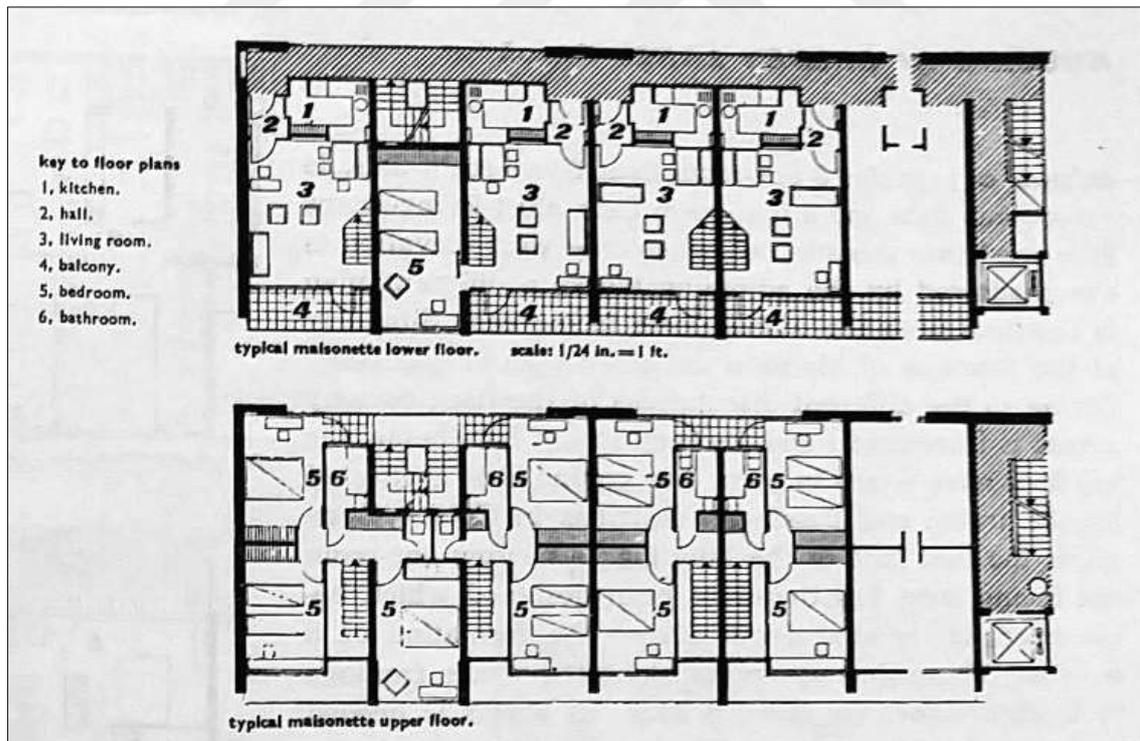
A June 1957 AR Issue Showing a Typical Floor Plan of the 16-Storey Block (McCallum, 1957, p. 417).
